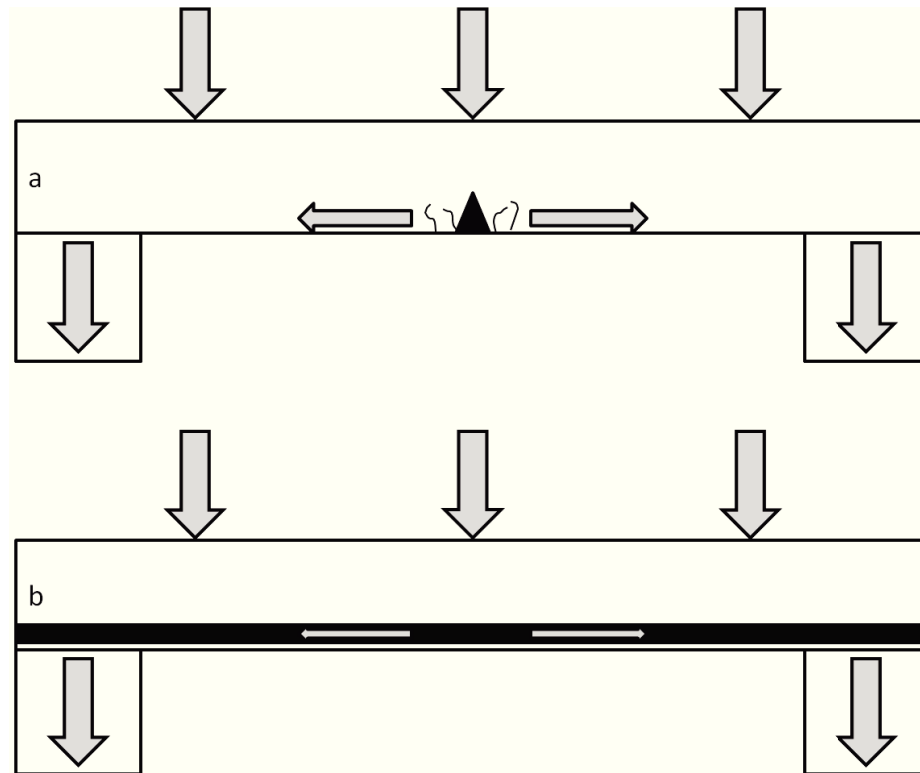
Effect of steel reinforcement in concrete in areas experiencing tensile stress.
